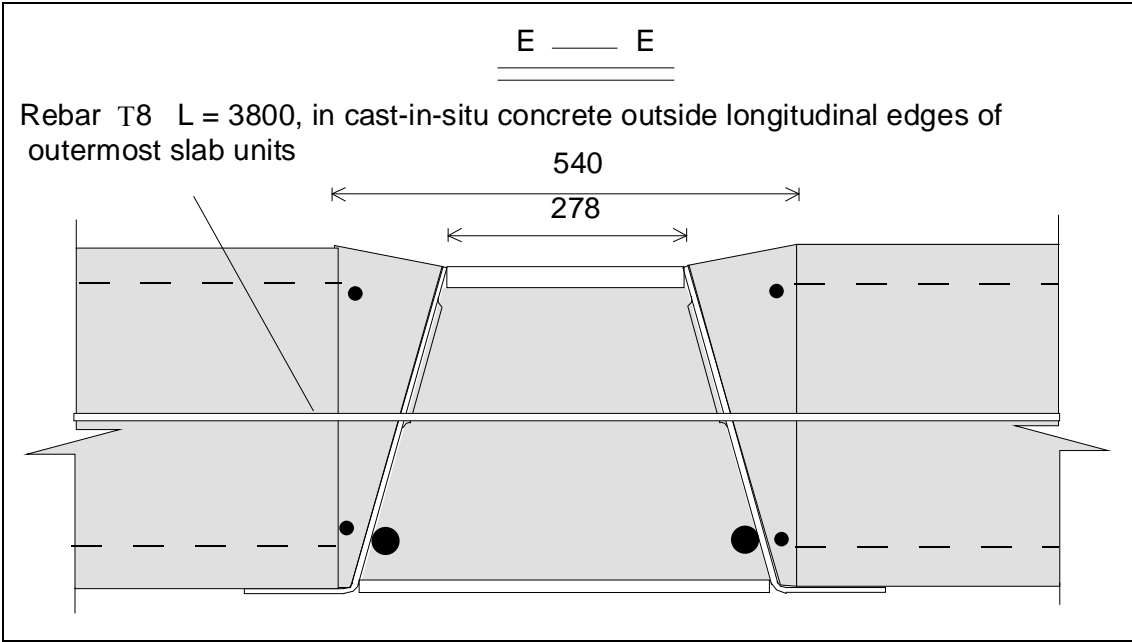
Section along outer edge of floor specimen, see Fig. 2.
